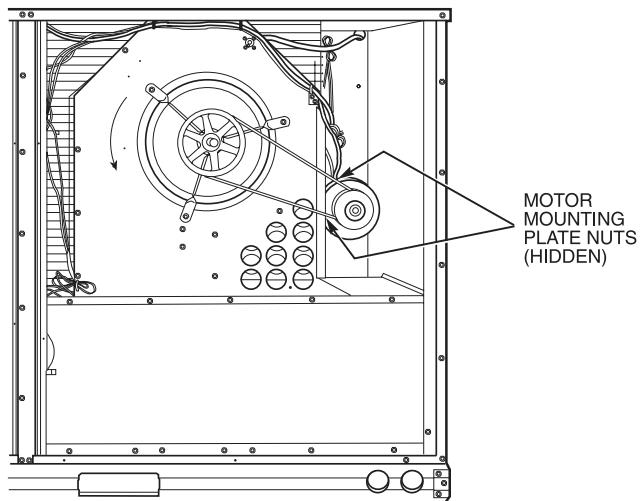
Typical Belt-Drive Motor Mounting for Sizes 120,121,150,151
